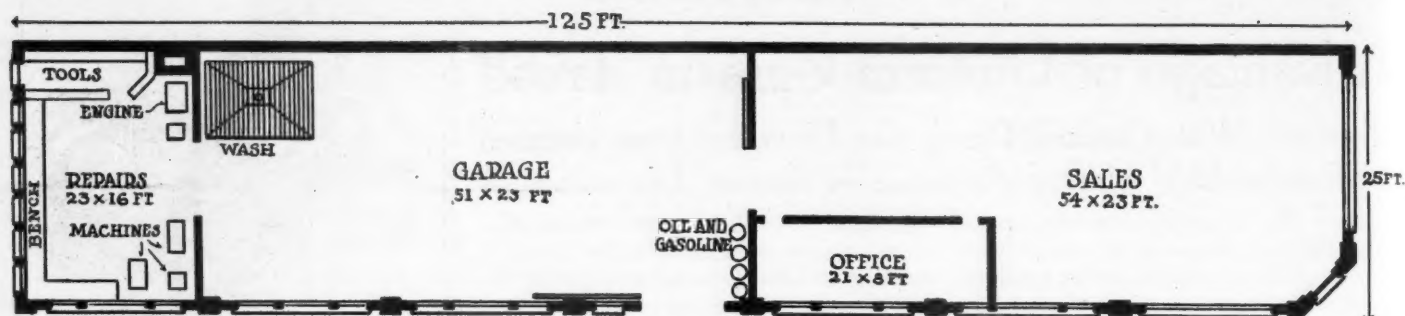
PLAN OF 125-FOOT BUILDING FOR GARAGE AND SALESROOM
